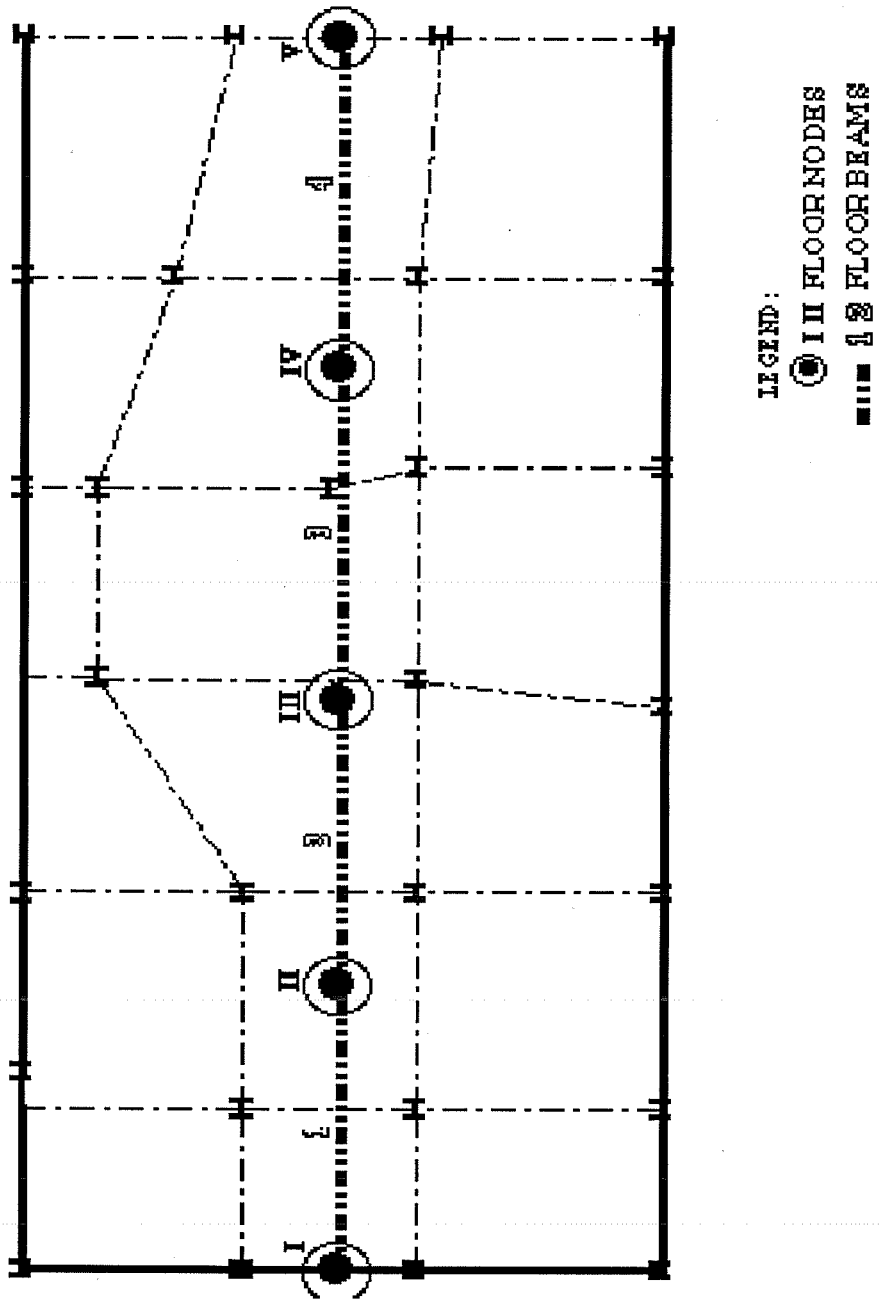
Numbering schemes for floor beams and floor nodes except at Level 2 (Hotel Woodrow)
